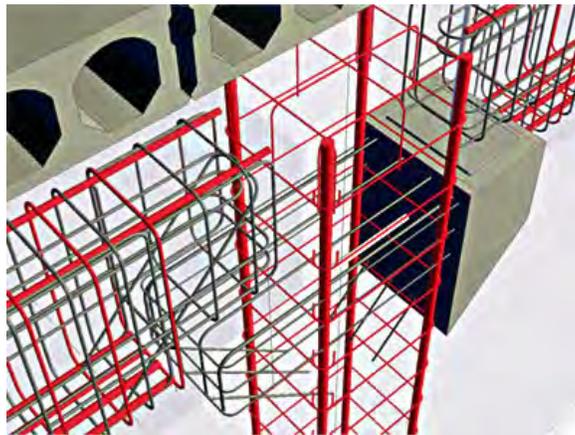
Typical Detail of a Cast-in-place Concrete Model
